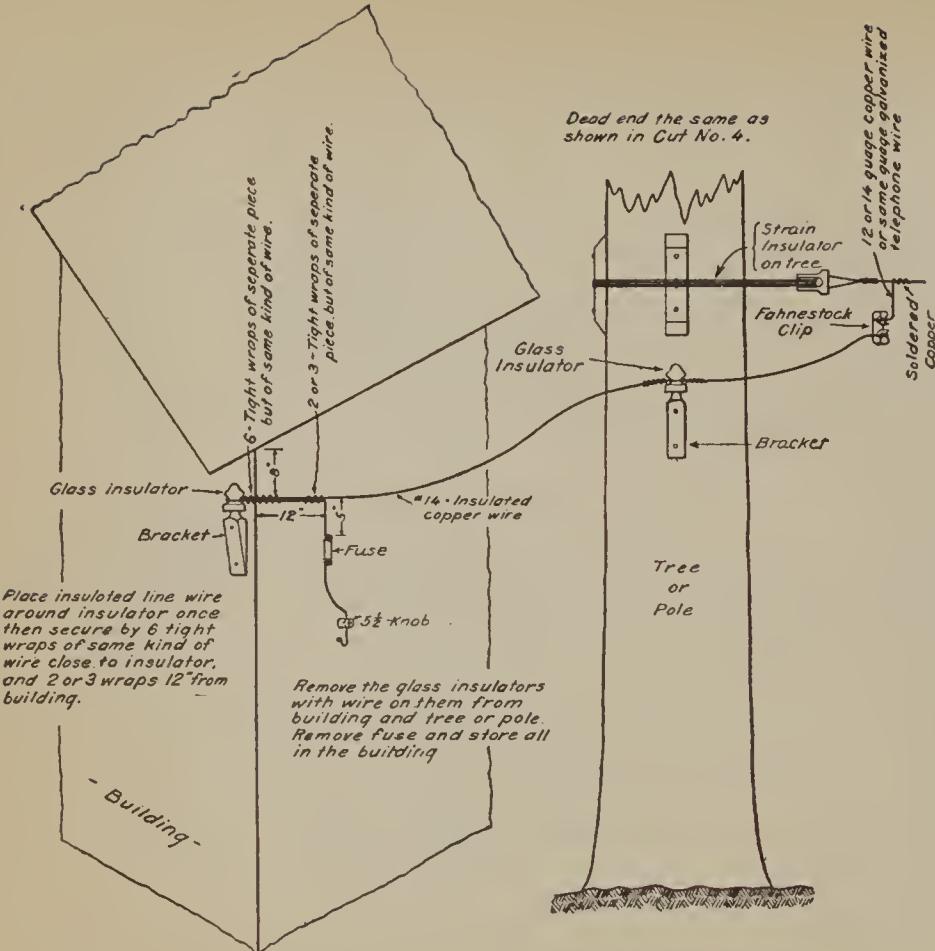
Method of installing drop wires at high elevations at uninhabited buildings during winter and where snow is heavy.
